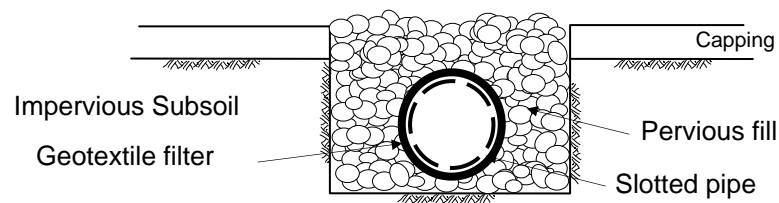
(c) - Cross-section of a subsoil drain where the pipe is wrapped in geotextile. (Used where the depth of the pipe is limited so that pervious subsoil drains cannot be used).
